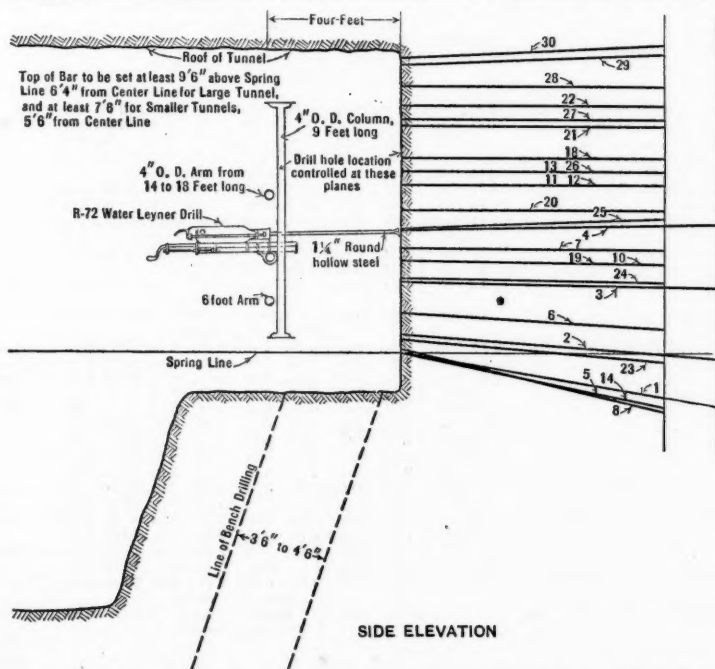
TUNNEL AT 54TH STREET AND EIGHTH AVENUE, NEW YORK, N. Y.
